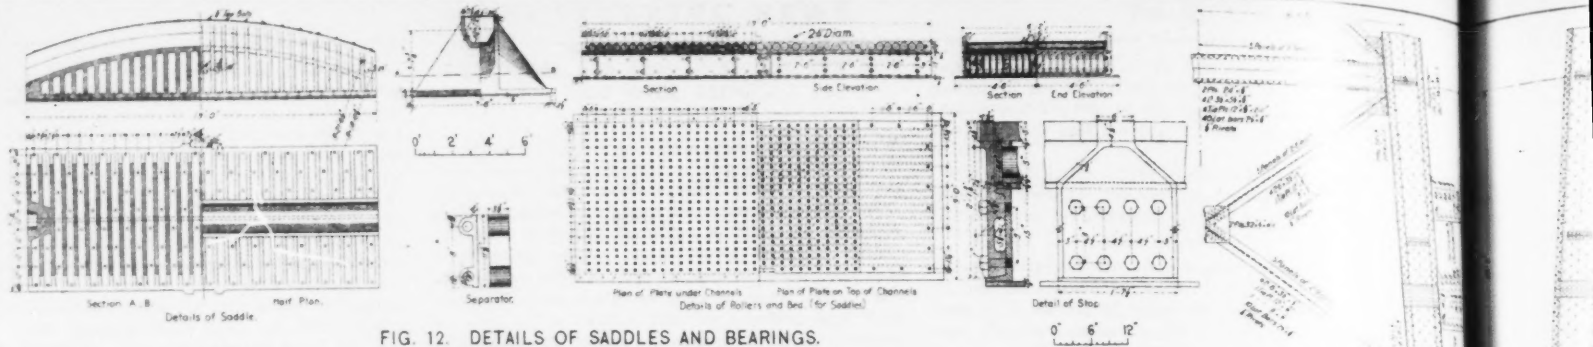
DETAILS OF SADDLES AND BEARINGS.
